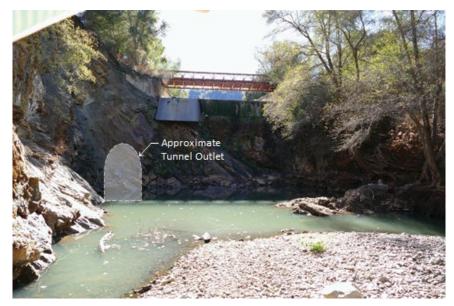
Proposed Sluice Tunnel Outfall Area
